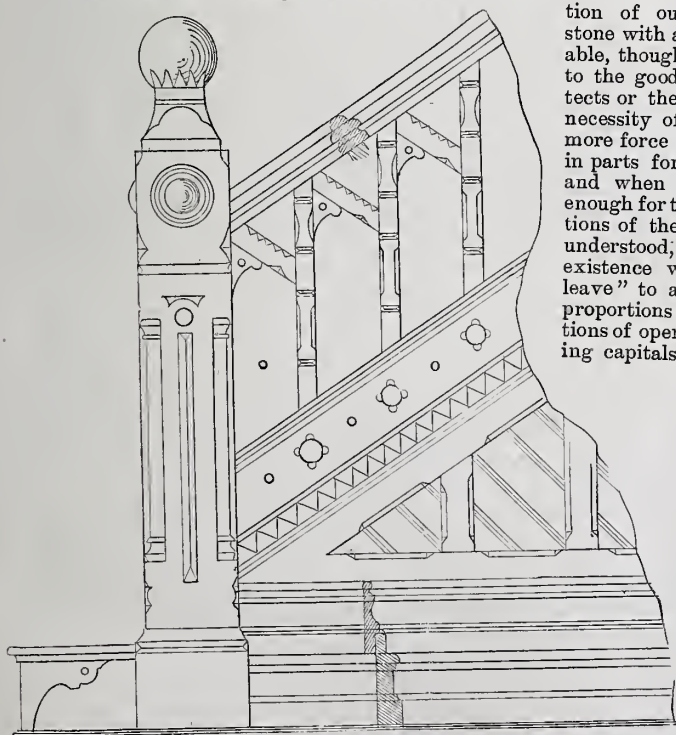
Detail of Newel-Post and Finish of Main Stairs.—Scale, 1/4 Inch to the Foot.
